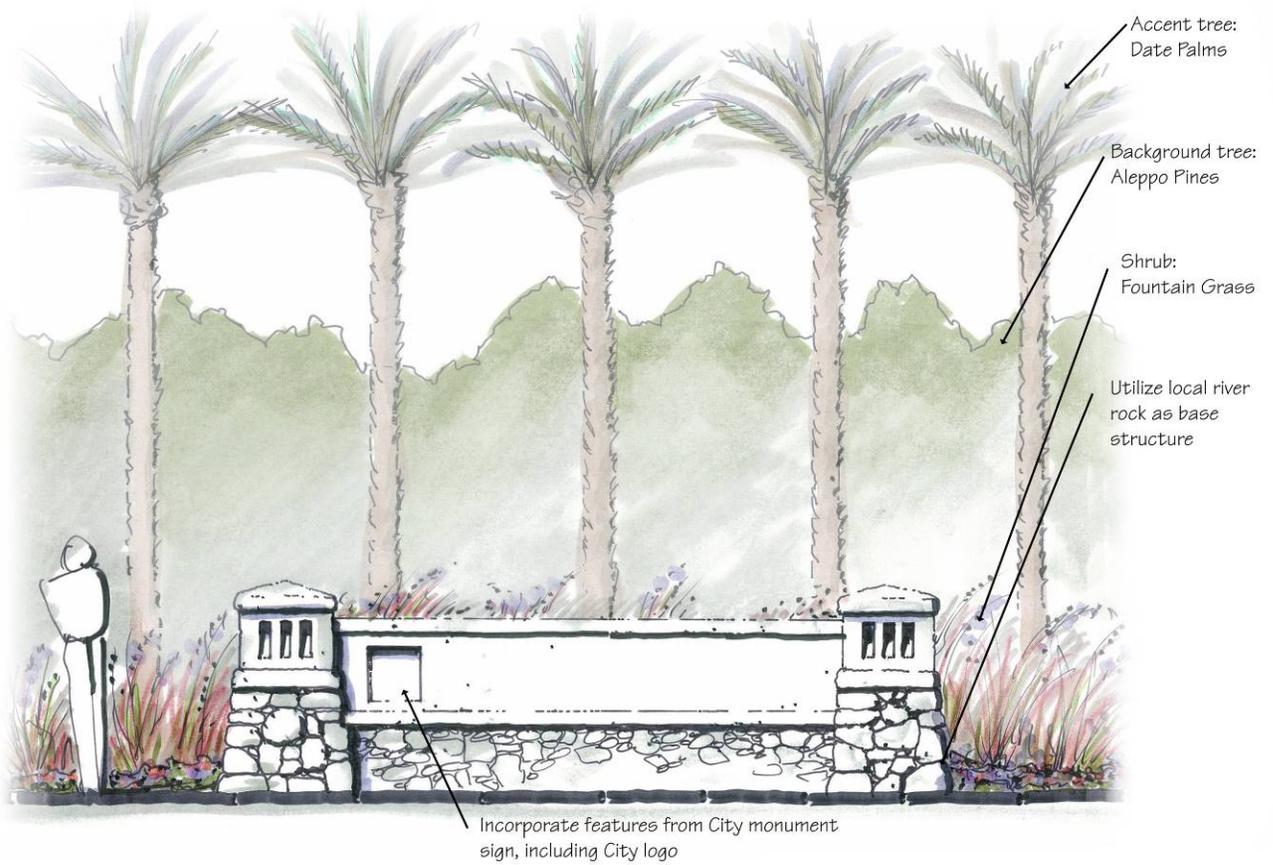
Tertiary Gateway Intersection Enhancement Concept
